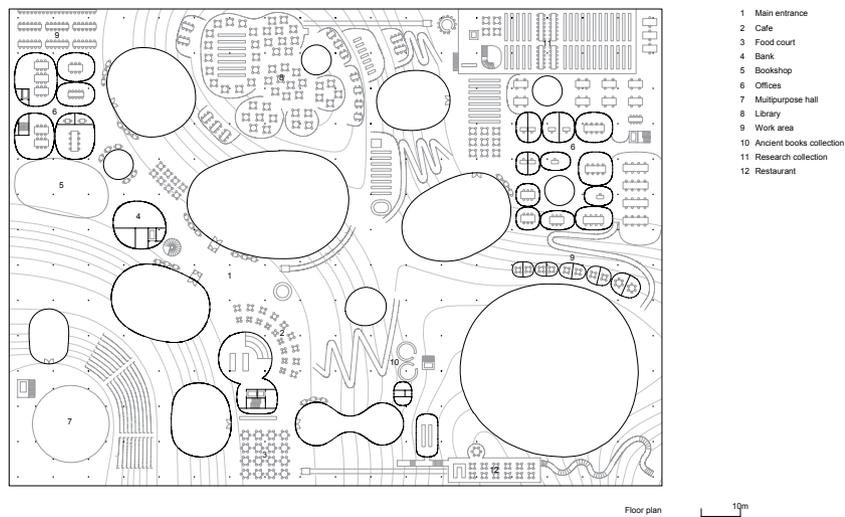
Learning Centre Floorplan 1:1'000 (SANAA 2010)
